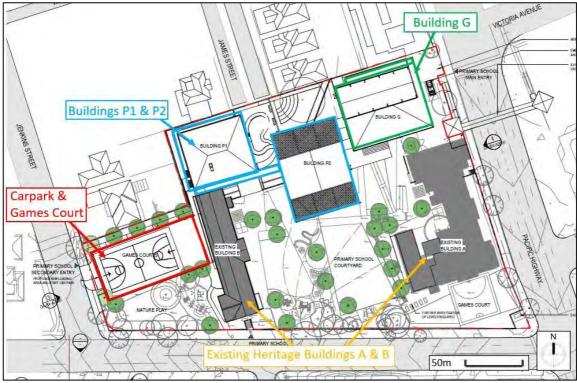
| CPS proposed site plan (Base source: RtS 2020)
